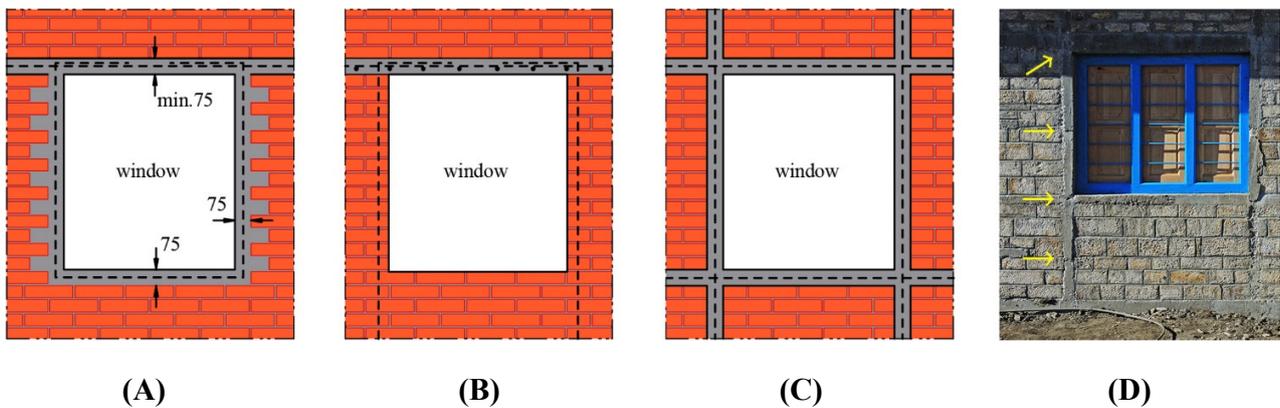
Principles of boxing of openings with (A) concrete frames with shear keys (following IS 13828:1993). (B) vertical bars (following NBC 202:1994). (C) continuous vertical posts and horizontal beams (following NRA, 2018). (D) Practical example of vertical posts next to openings. (A-C by courtesy of Smart Shelter Foundation, D by courtesy of Preci).
